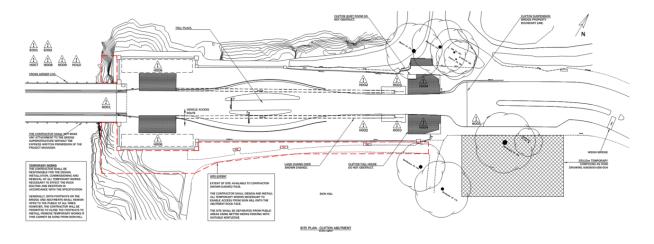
Plan of Clifton Abutment (Proposed Temporary Compound shown hatched)
